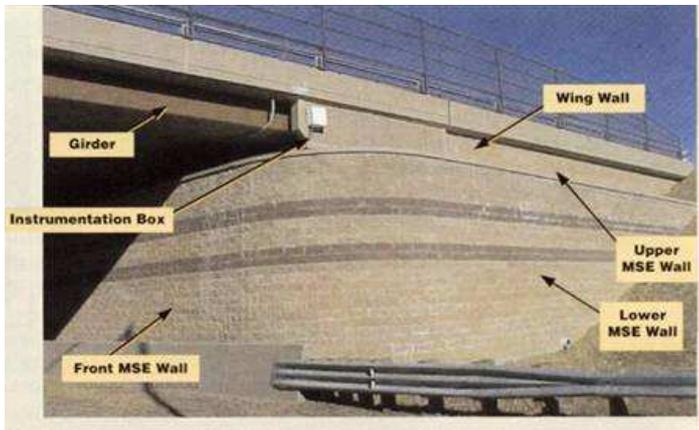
Bridge abutments with footing surcharge using geogrid reinforcement
